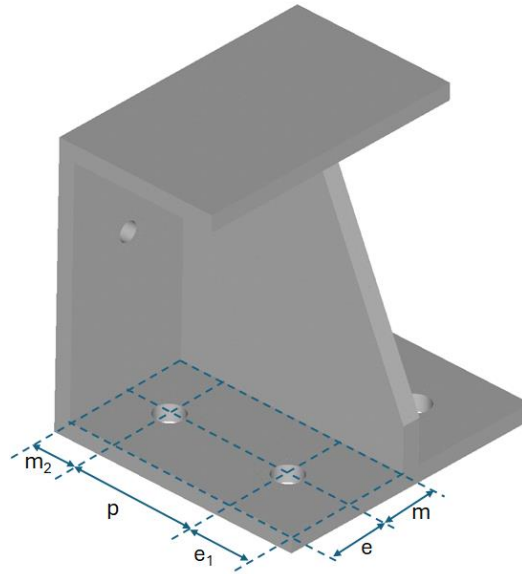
Definition of geometrical dimensions m , m_1 , e , e_1 and p
